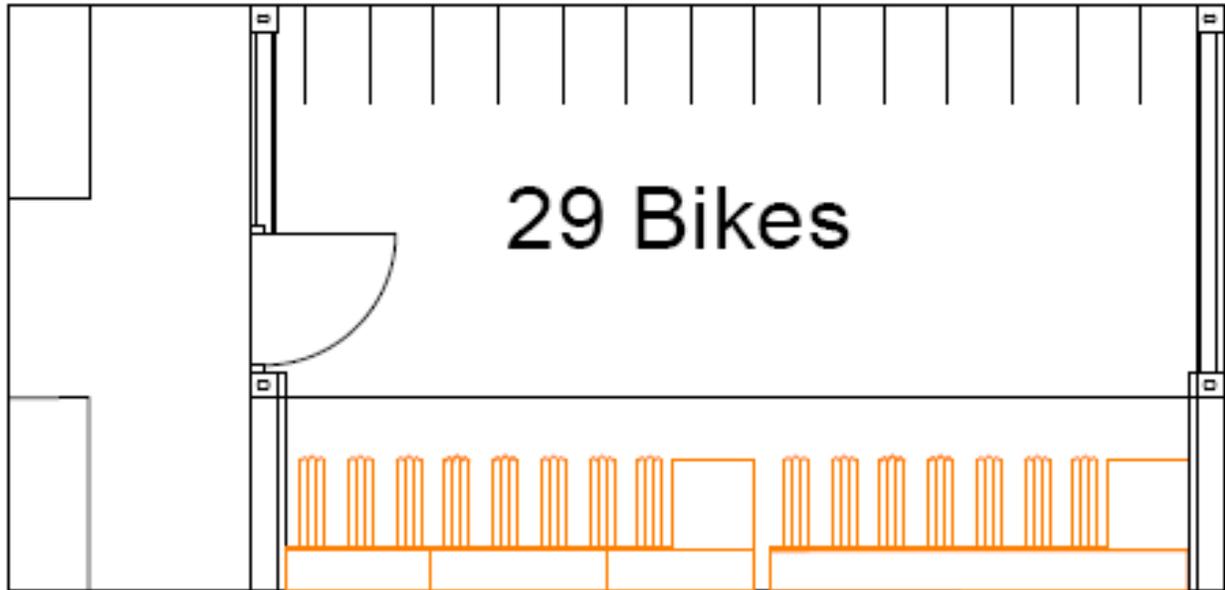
Plan view of Bike Storage structure. Entryway/retail area is on the left. APPENDIX A
